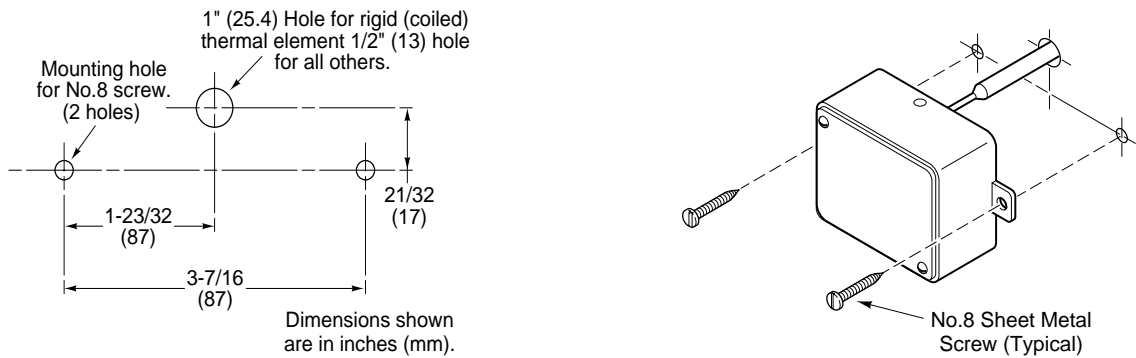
Surface Mounting Hole Dimensions and Duct Installation Detail.
